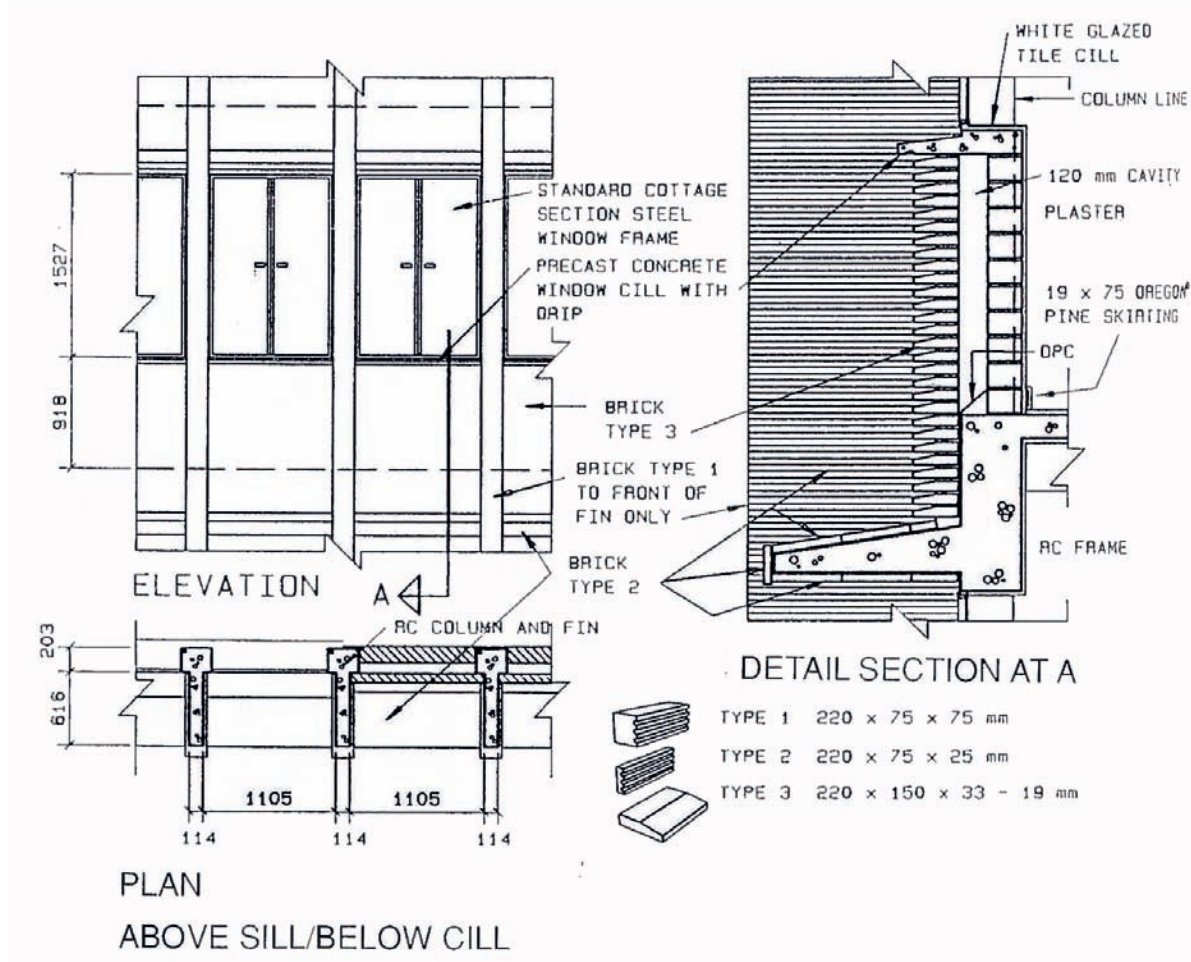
Drawing showing the three brick types, and a section through brick type 3
